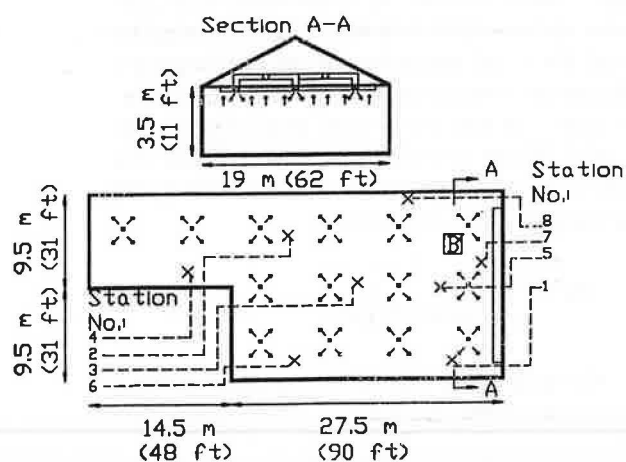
Layout and cross-section of the plant designed for DILVENT (not to scale)
